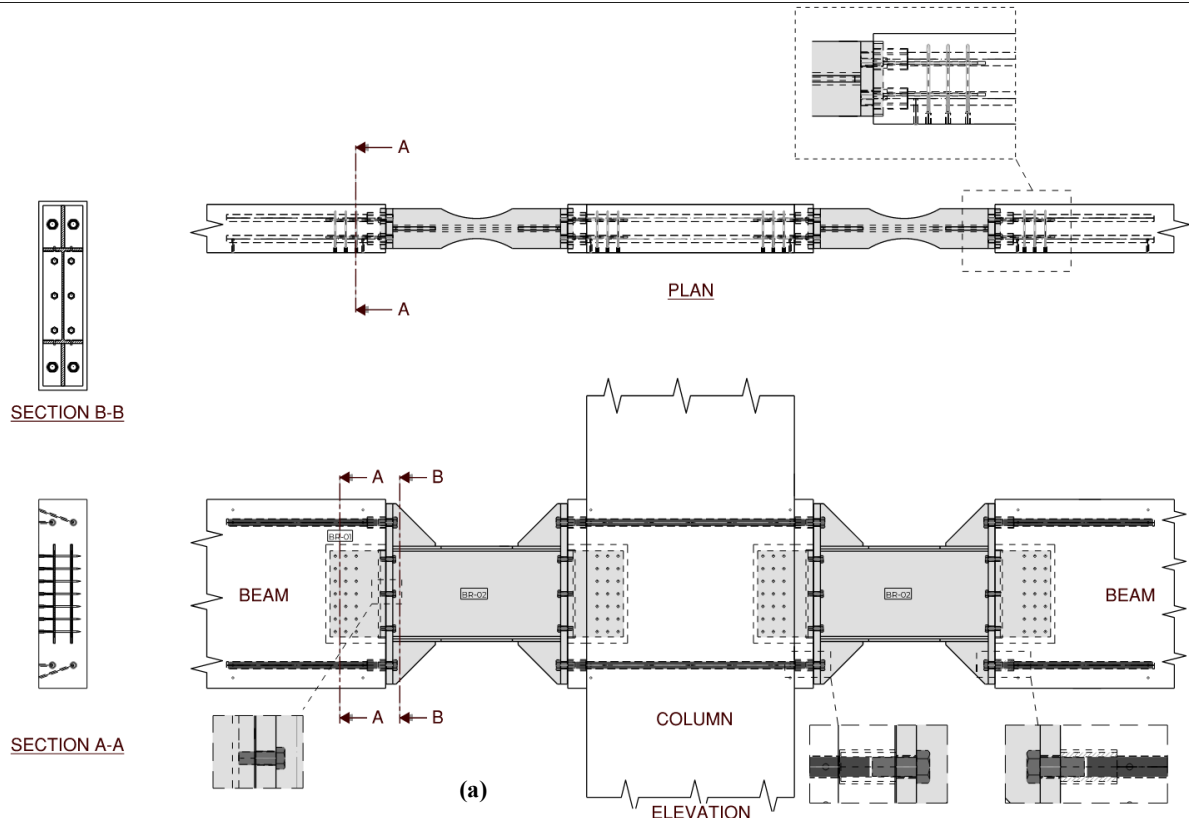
(a): Red Stag Timberlab shop drawing models for the tested internal beam-to-continuous column joint.
